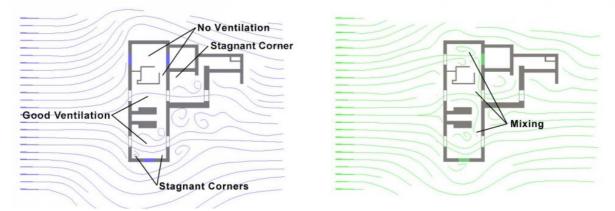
floorplan zoning and the different effect of wind driven ventilation with different placed windows (source: http://sustainabilityworkshop.autodesk.com/buildings/wind-ventilation)
